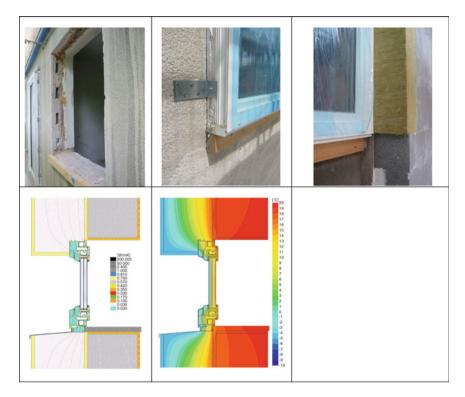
Example of old window replacement: (a) old Window opening with masonry rabbets removed. (b) The addition of a horizontal wooden support facilitates fixture of windows; it is installed and leveled in advance and bears the window's weight. The window is then fixed with stainless steel angle brackets. (c) Top and lateral parts of the window frame are covered with the exterior wall insulation as far as possible. (d) Schematic of window installation. (e) Thermal image of window performance
